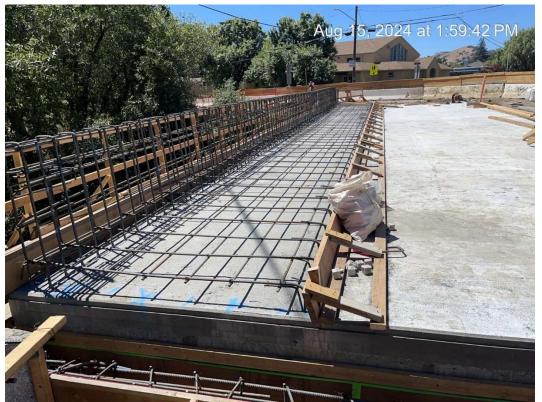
Sidewalk and Railing (Type 732 SW) Reinforcement complete.
